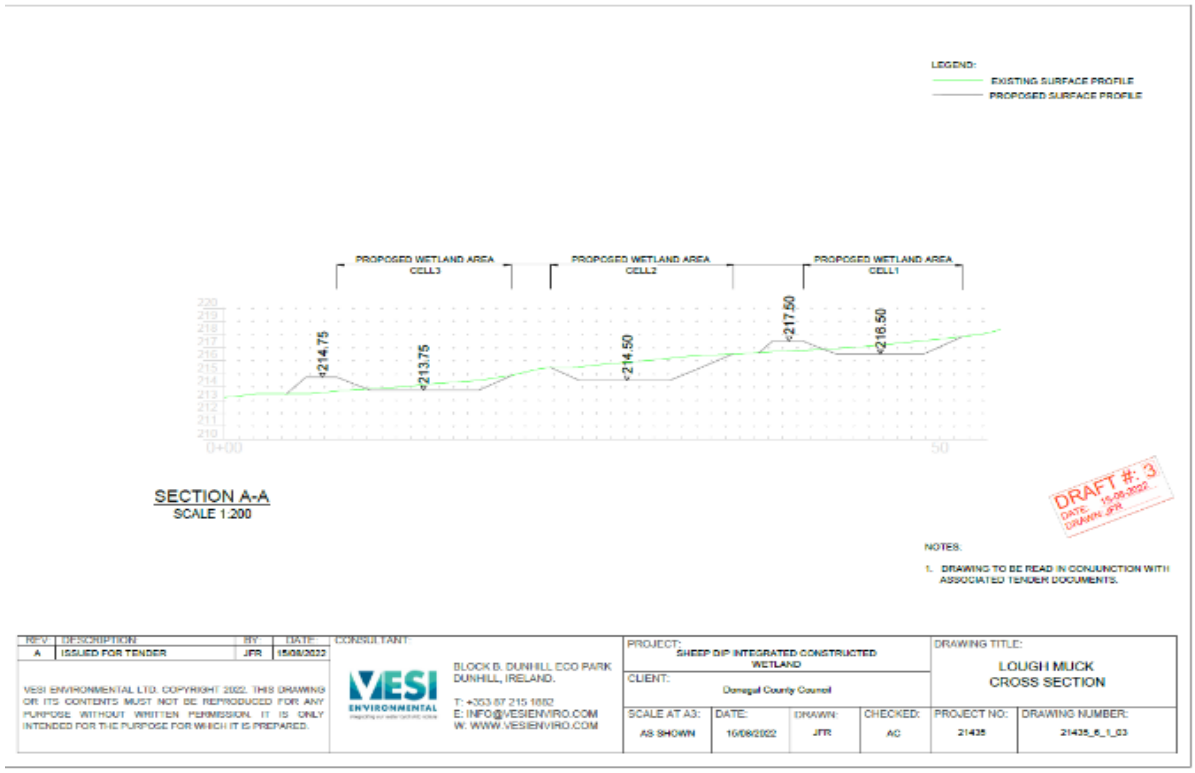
, LOUGH MUCK ICW CROSS SECTION.
